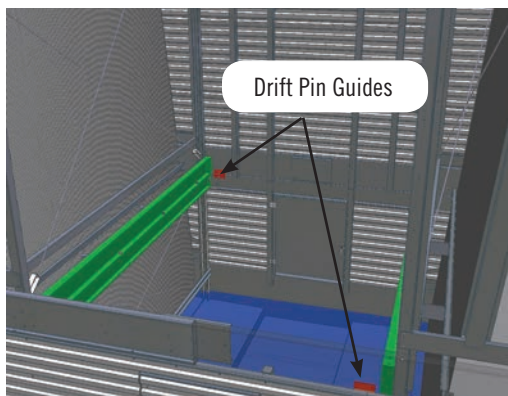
Upper and Lower Assembly - Drift Pin Guides
